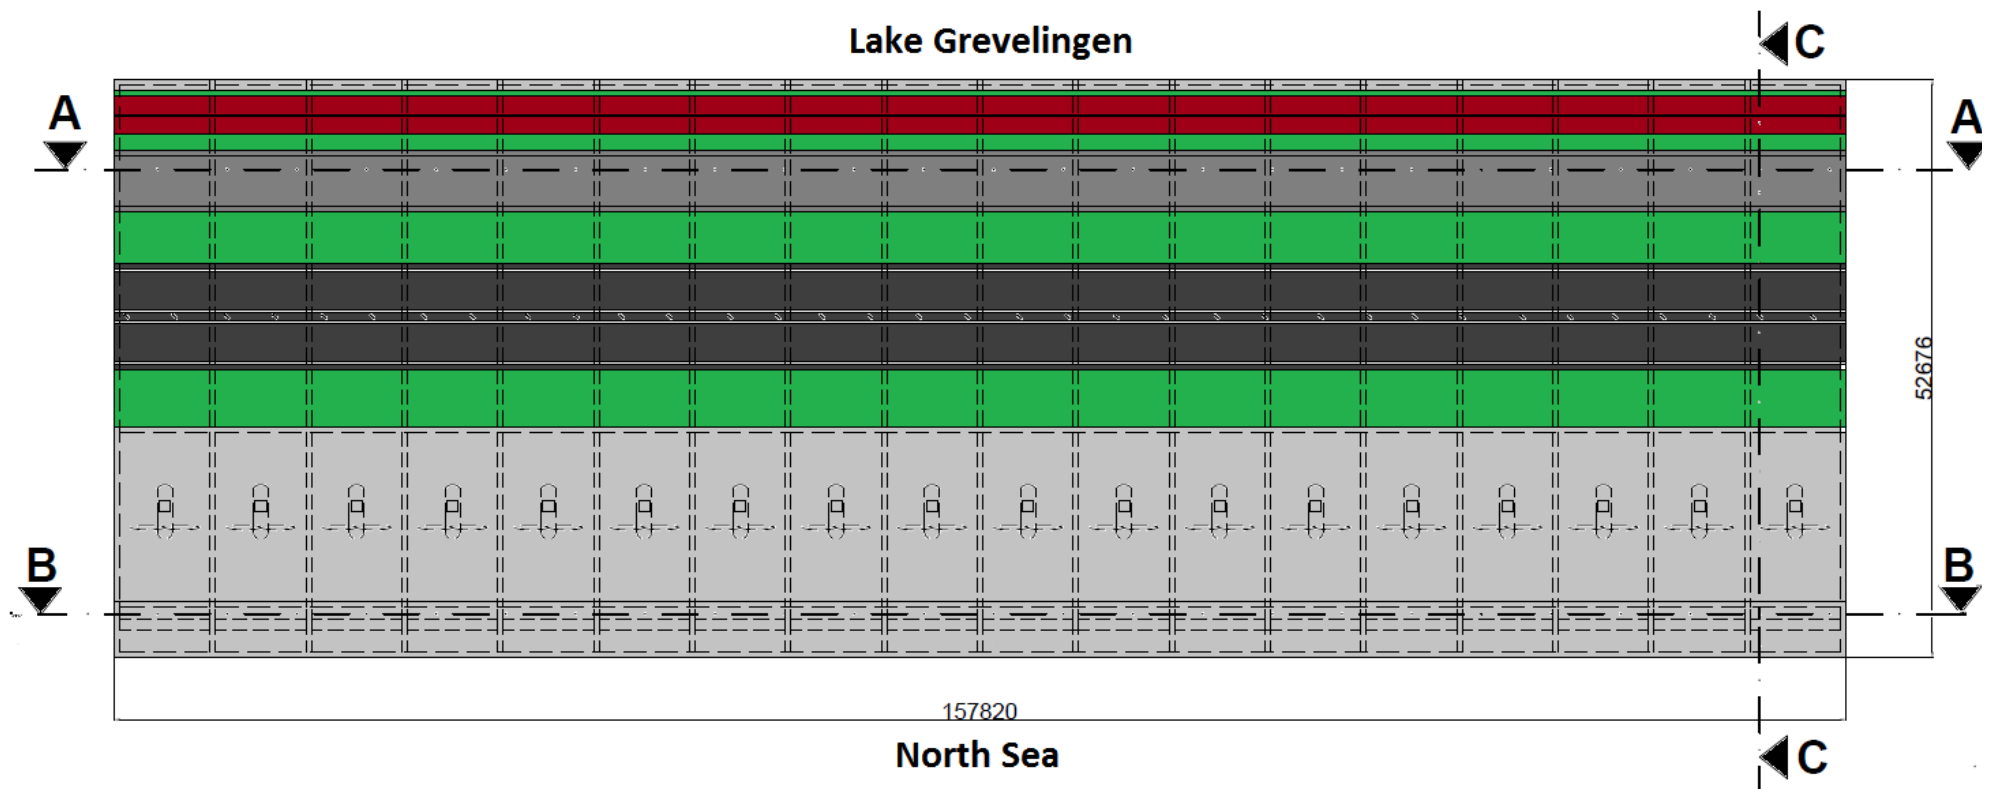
TOP VIEW TIDAL POWER PLANT
